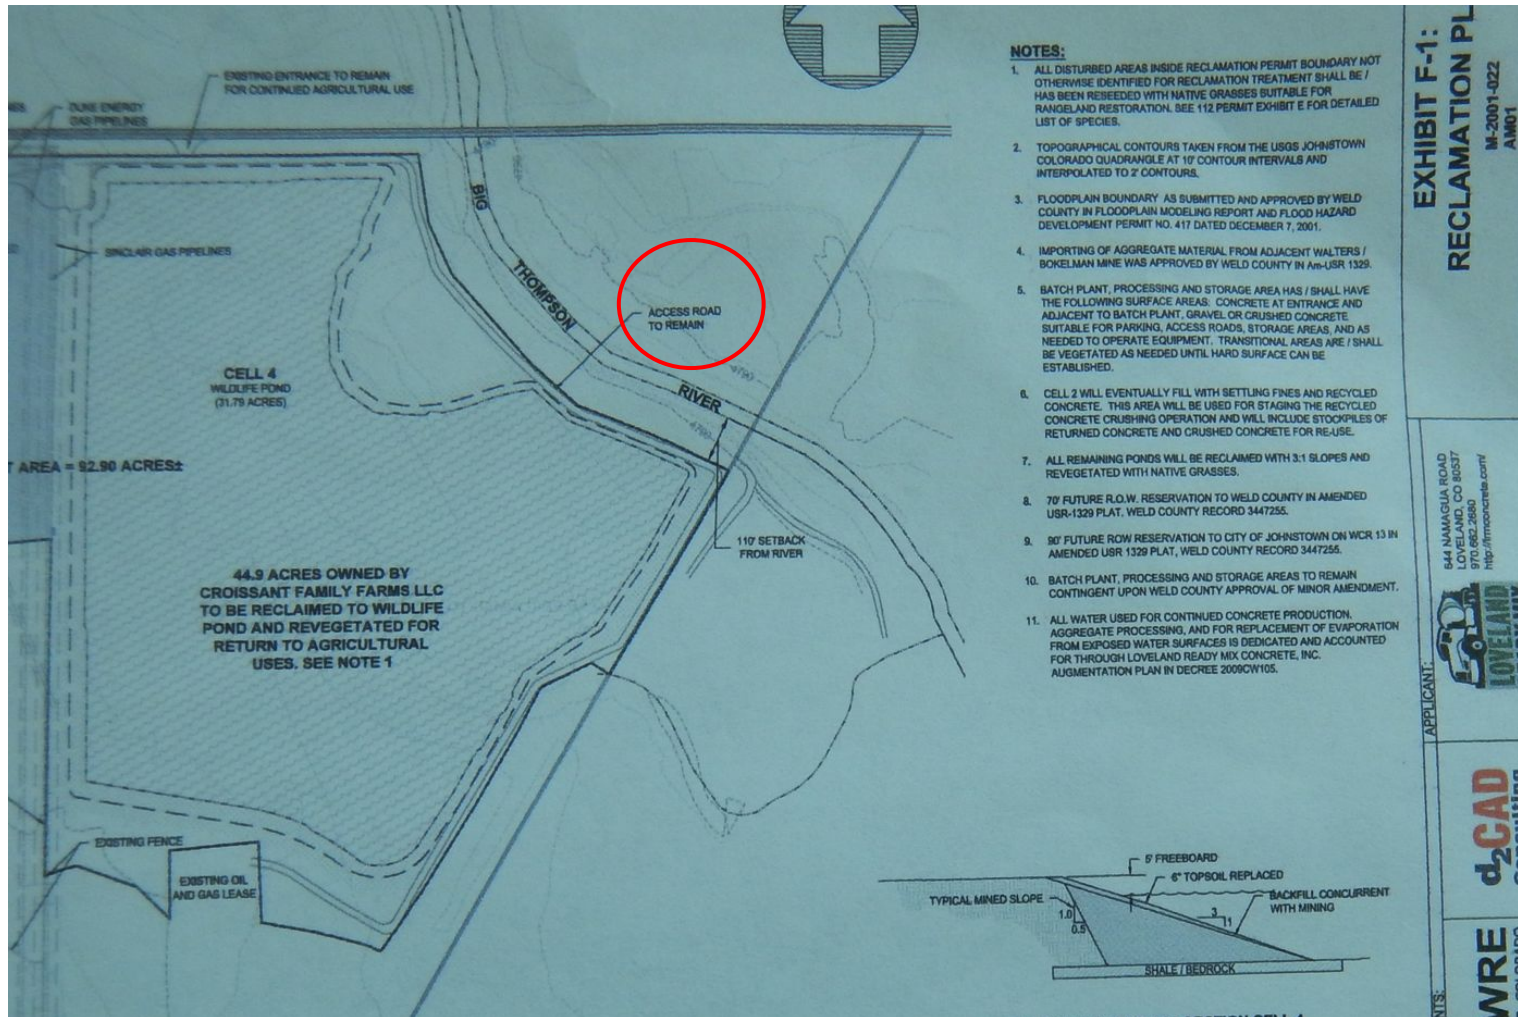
DRMS Reclamation Plan Exhibit F-1 illustrates the eastern access road in question was indeed built for DRMS mining purposes, not for oil and gas. DRMS Reclamation Plan indicates the access road to remain.
